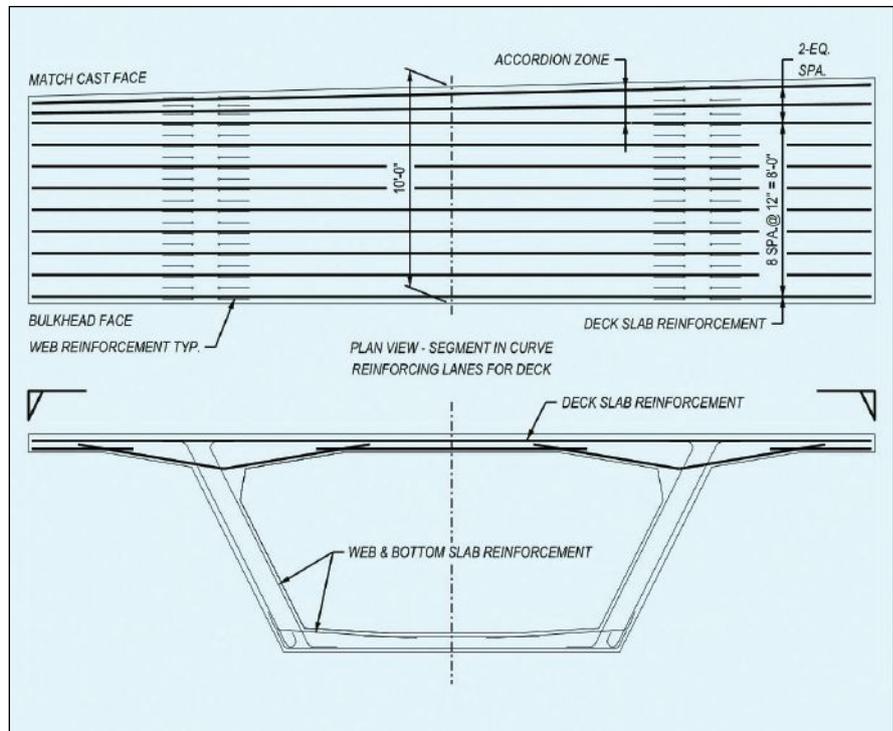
Adopt a reinforcement layout early in the design, and create dedicated lanes of reinforcing bars with spacings of common multiples. When segments have a skewed face, space the bars parallel to the bulkhead (the square end) from the bulkhead to beyond the anchor block reinforcement or other details requiring integration. Then, vary the spacing in an accordion fashion for a limited length near the skewed face. Web and bottom slab reinforcement would be placed using the same approach. Figure: McNary Bergeron & Associates.
